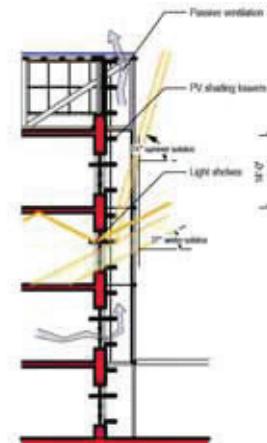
Section through proposed double skin facade at Bronx High School of Science. A facade farm is proposed for the southern facades.[36]
